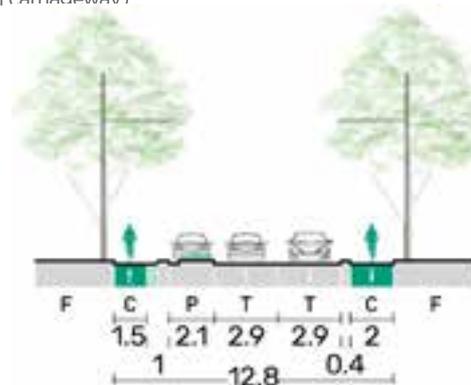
Typical cross section - constrained configuration (12.8m carriageway)
